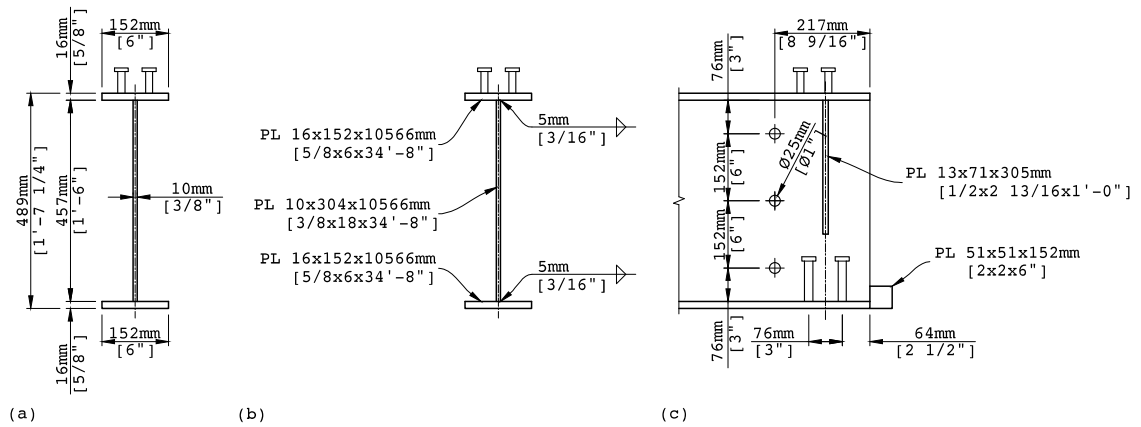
Details of the girder: (a) girder cross section dimensions, (b) girder details, (c) girder details over the pier
